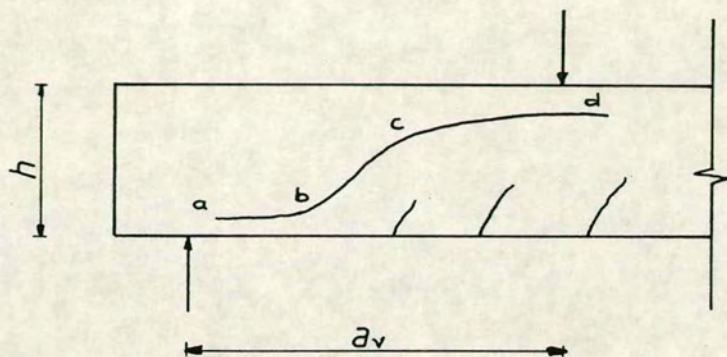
Shape of the Inclined Crack Characterising Diagonal Tension Failure
